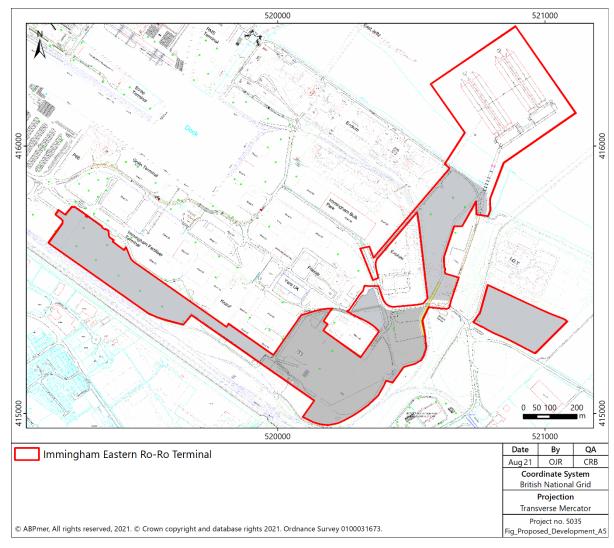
Layout of proposed landside works at Immingham Eastern Ro-Ro Terminal
